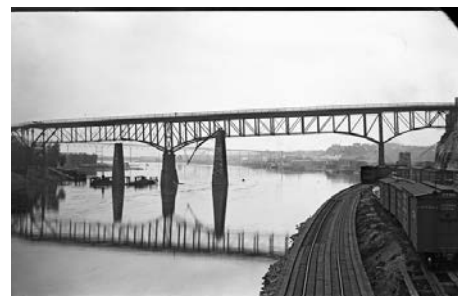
Looking west at the CM&StP railroad tracks under the 1890 Wabasha Bridge with the 1889 High Bridge in the distance (1895).
